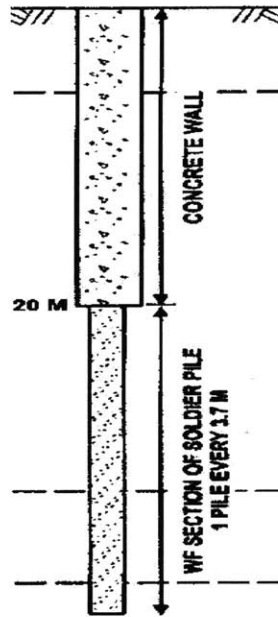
SPTC Wall Detail (Koutsoftas et al., 2000)
